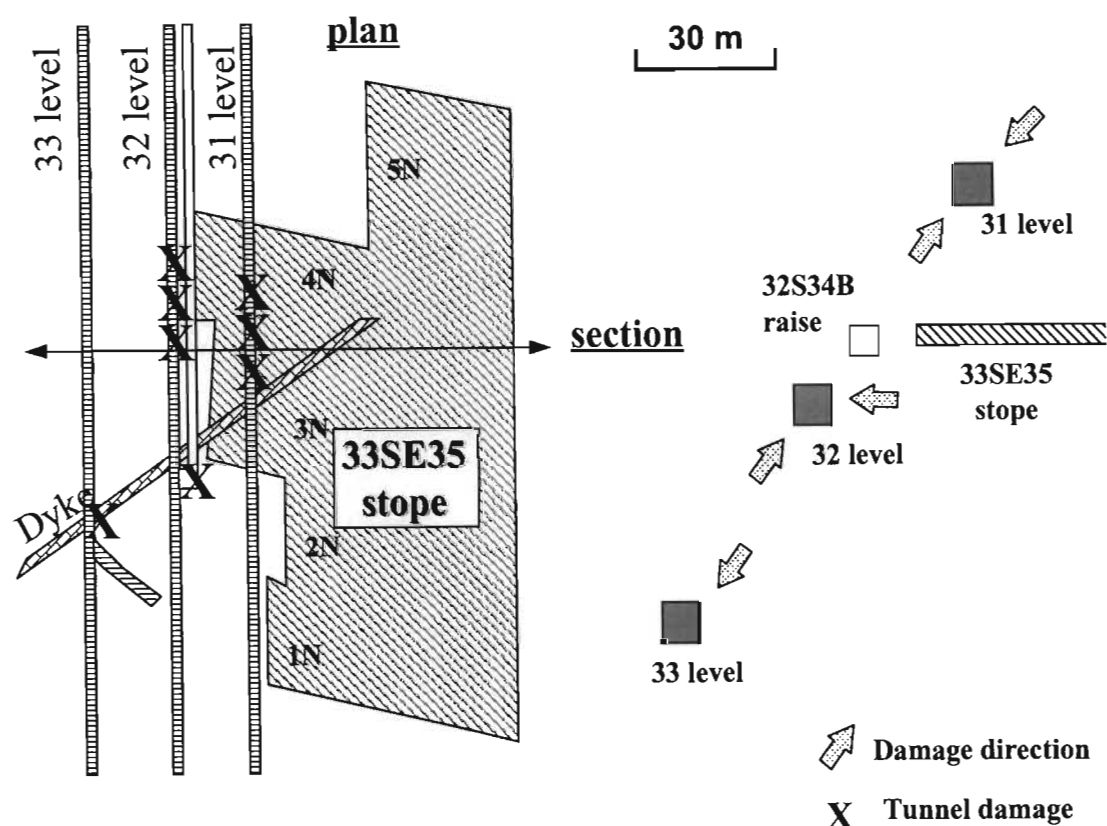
Plan and section of tunnel damage in the vicinity of 33SE35 stope.
